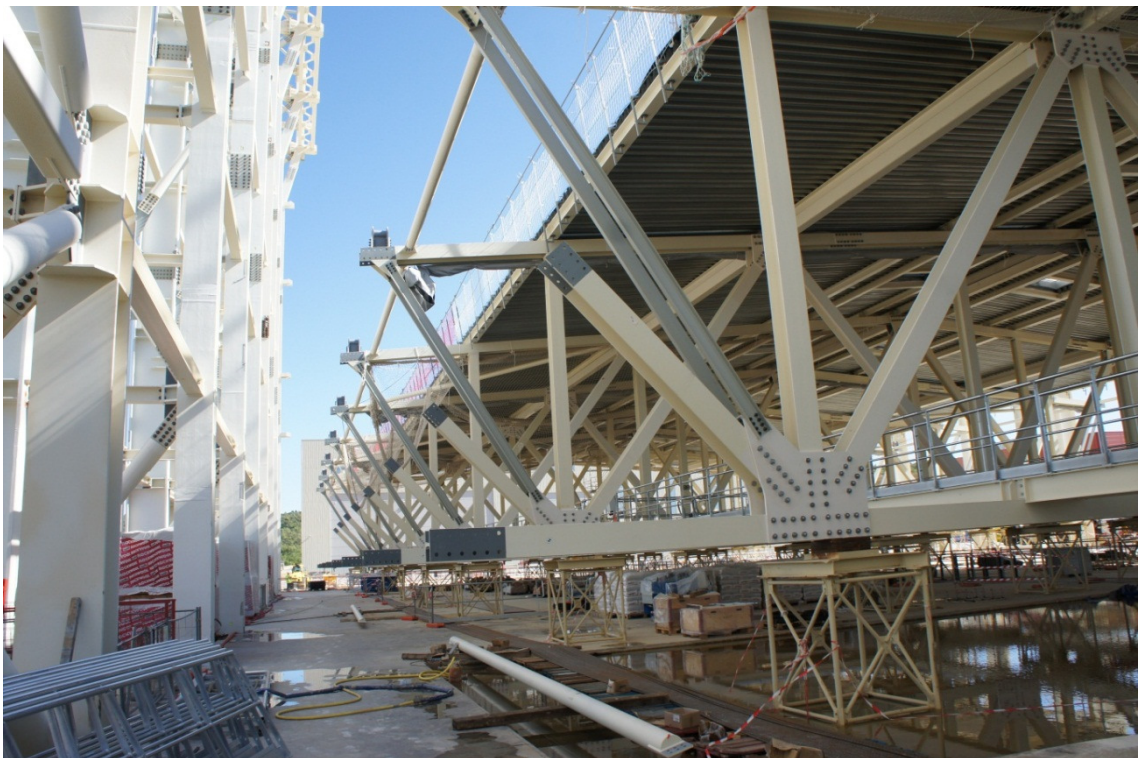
2015-08-25 – Final touches to the roof structure at ground level
